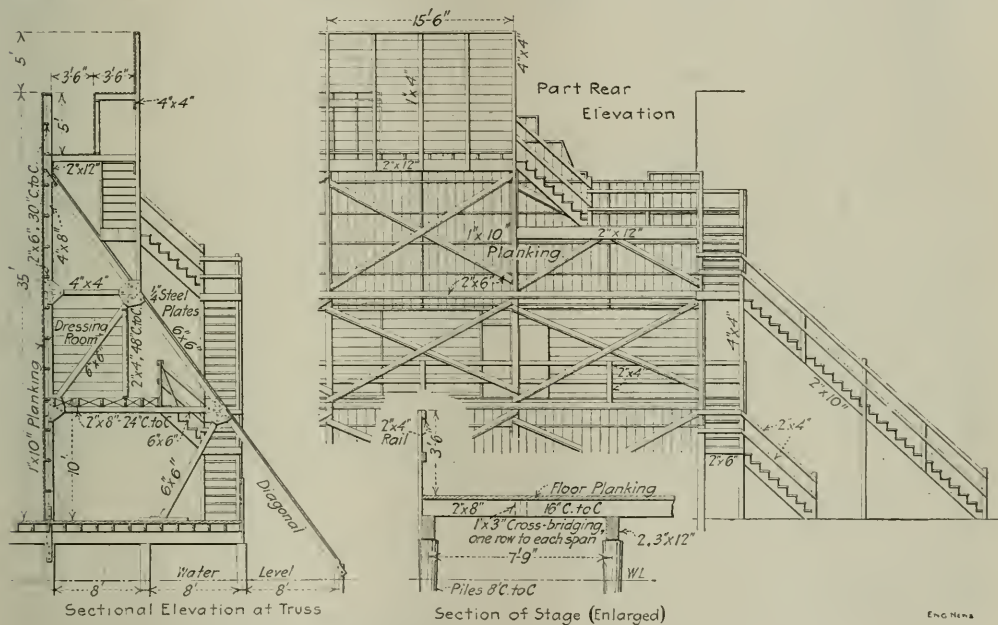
THE 50-FT. TIMBER WALL OR SOUNDING BOARD, WITH ITS TRUSS SUPPORTS
